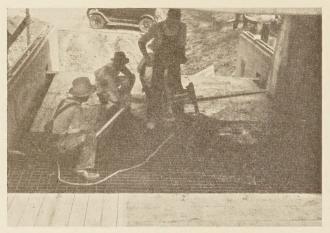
COMPLETED STEEL MAT OF FIRST SLAB BEING FILLED WITH CONCRETE BY MEANS OF ELECTRIC VIBRATOR
